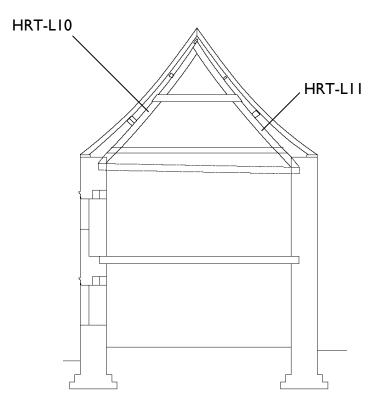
Truss 9 (west face), showing the location of samples HRT-L10 and HRT-L11 (Morton & Hall Consulting Ltd)
